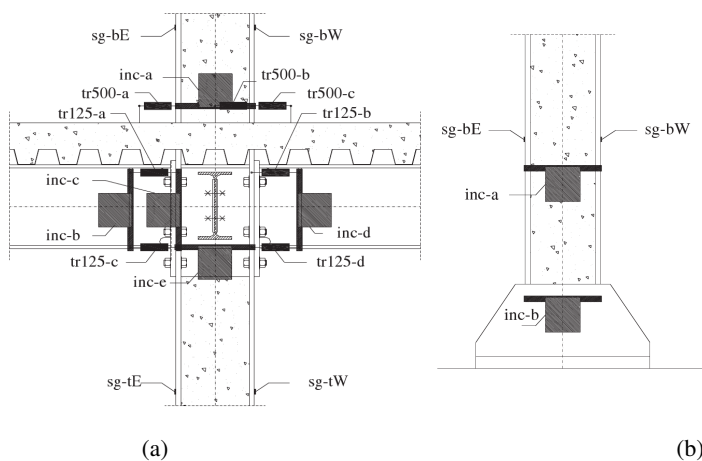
Examples of instrumented joints: a) interior joints (2-B) at the bottom storey; b) base joint (2-B).
